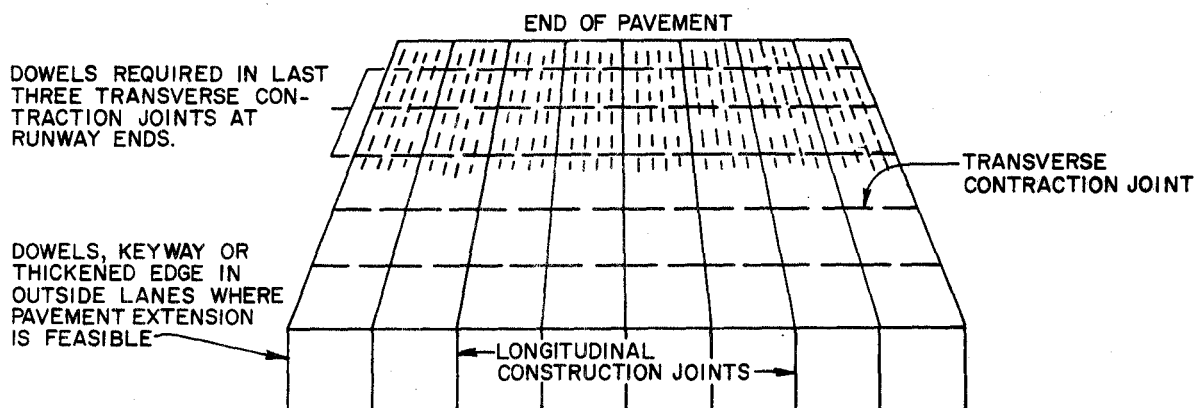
EXPANSION JOINTS FOR JC PAVEMENTS
